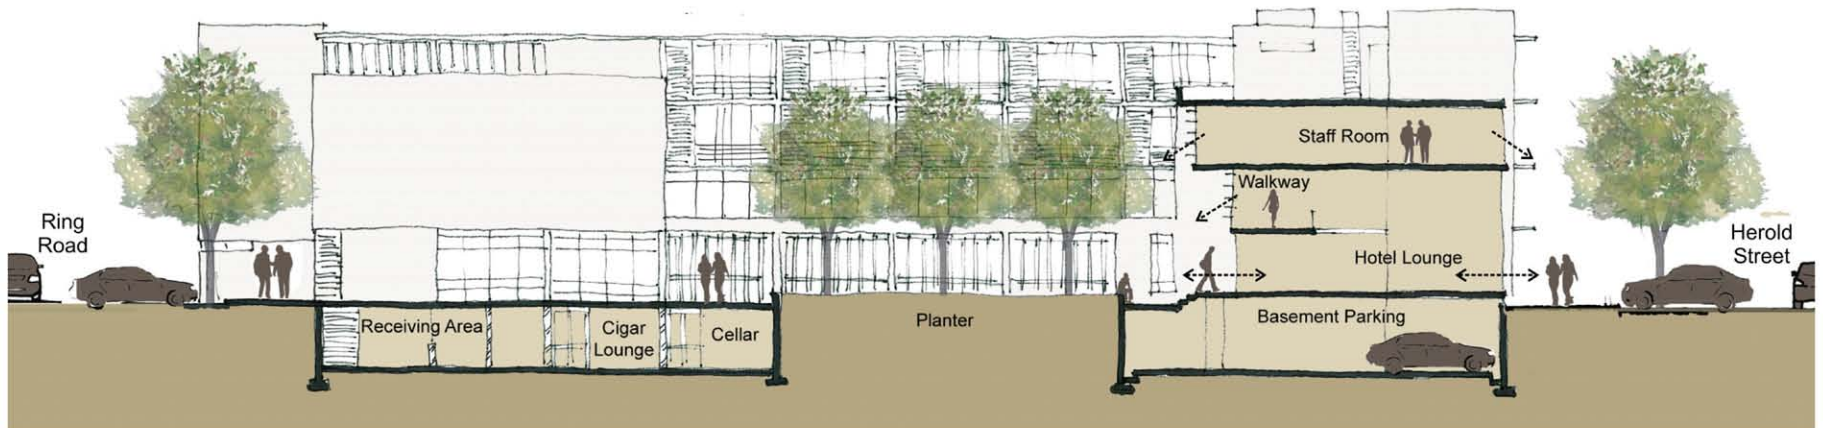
Section looking northwards - exploring the building as viewing platform
